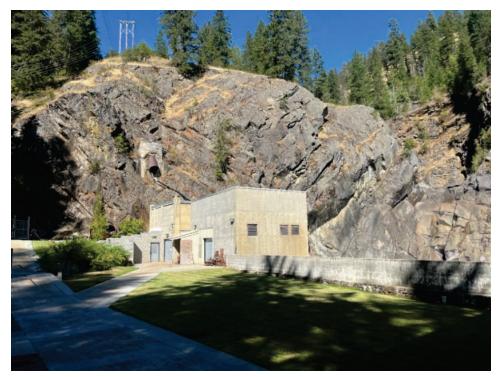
Moyie Dam spillway and low-level outlet.
